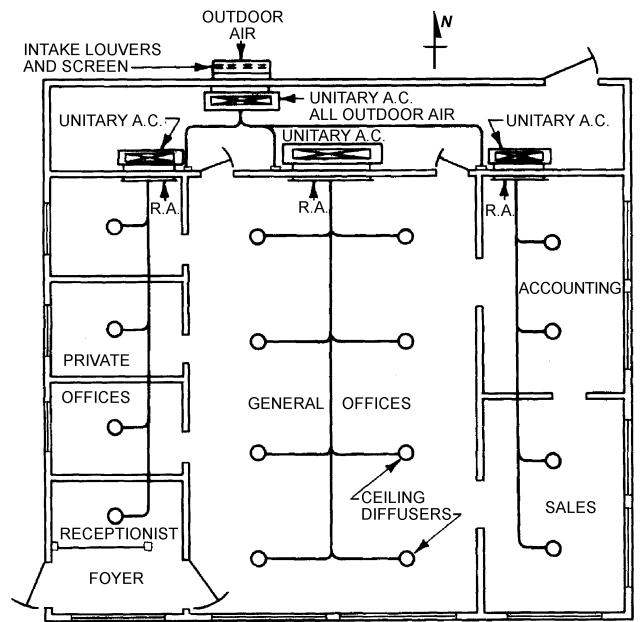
Multiple-Packaged Units with Separate Outdoor Air Makeup Unit
